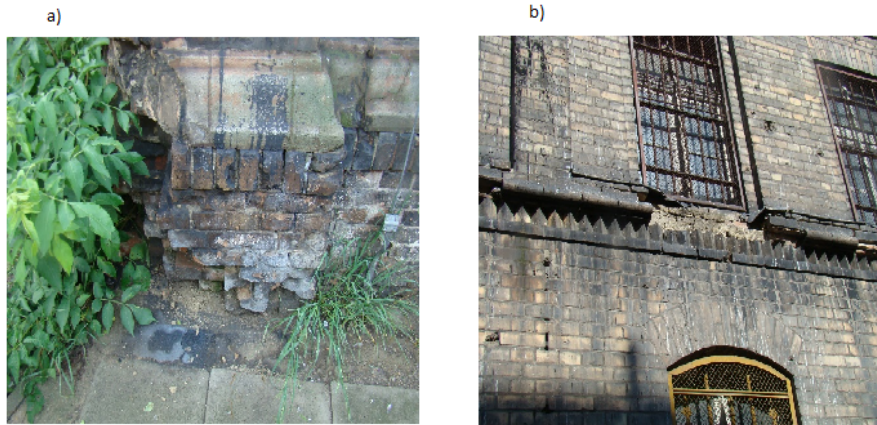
Building planned for modernization - south-eastern elevation: damage to the brick wall: a) in the level of the plinth, b) in the level of the above-ground part
